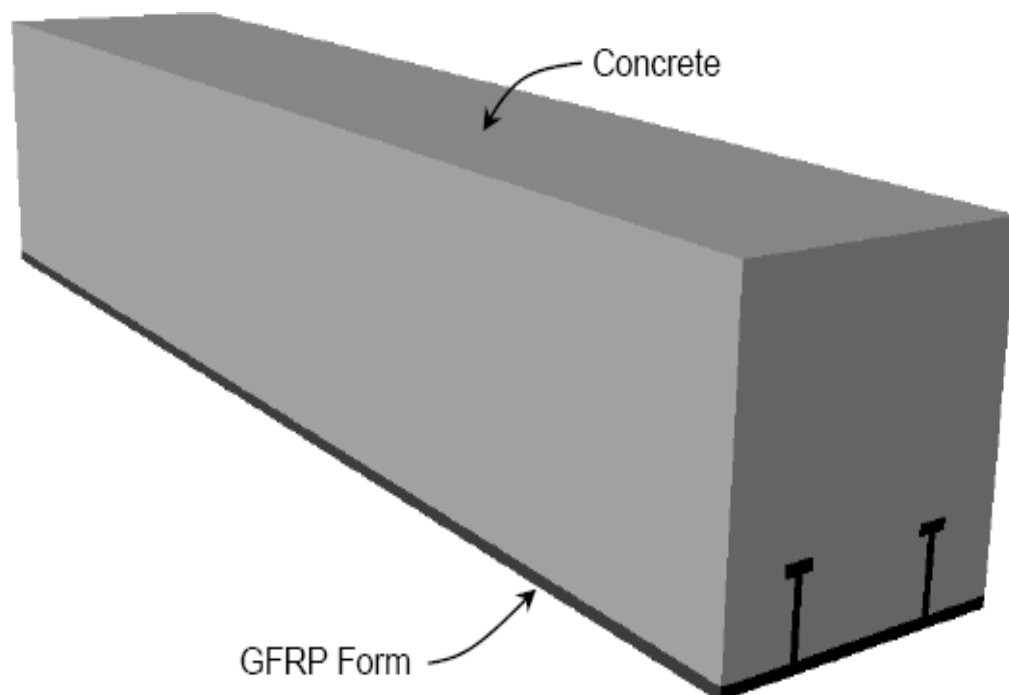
Concrete and GFRP Ribbed Sheet Hybrid Section (*Hall et al. (1998)*)
